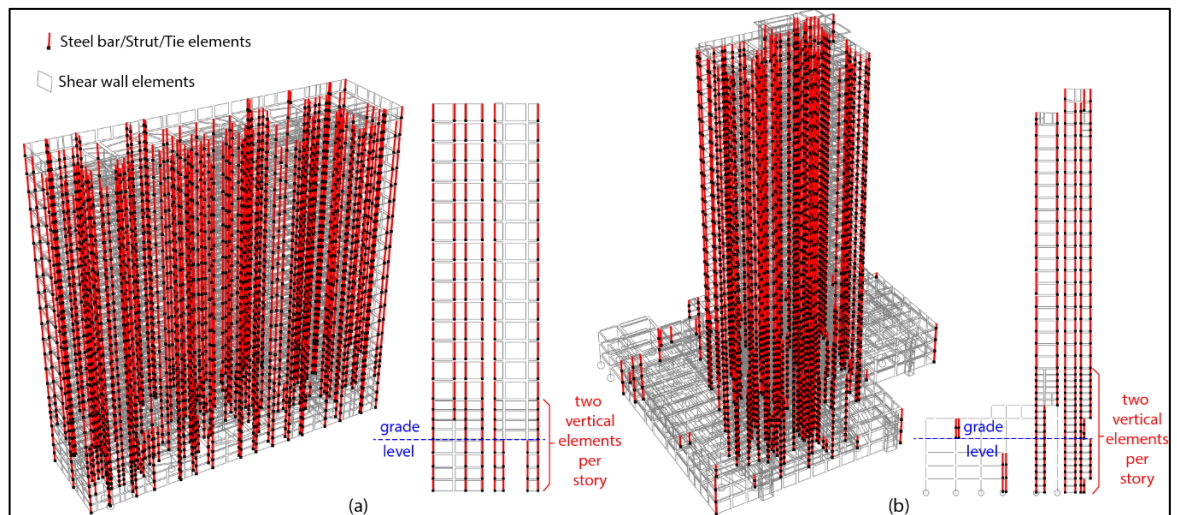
Three-dimensional view and plane elevation of models of the (a) 17-story building and the (b) 26-story building
